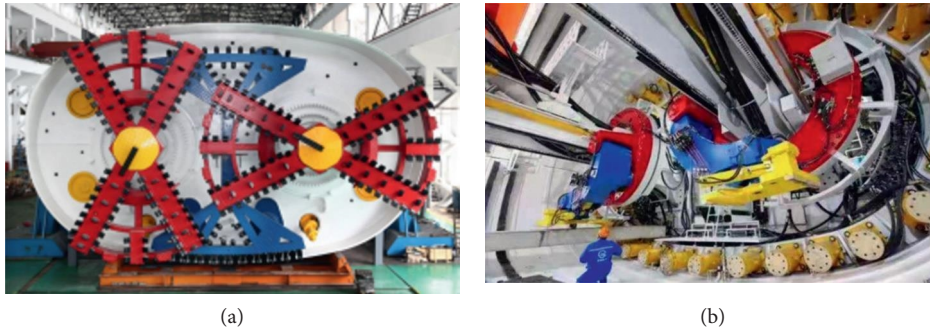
Quasi-rectangular earth pressure balance pipe jacking/shield dual-mode tunnelling machine: (a) The cutter head of dual-mode tunnelling machine. (b) Reformed shield segment assembly machine (pipe jacking machine mode without segment assembly machine).
